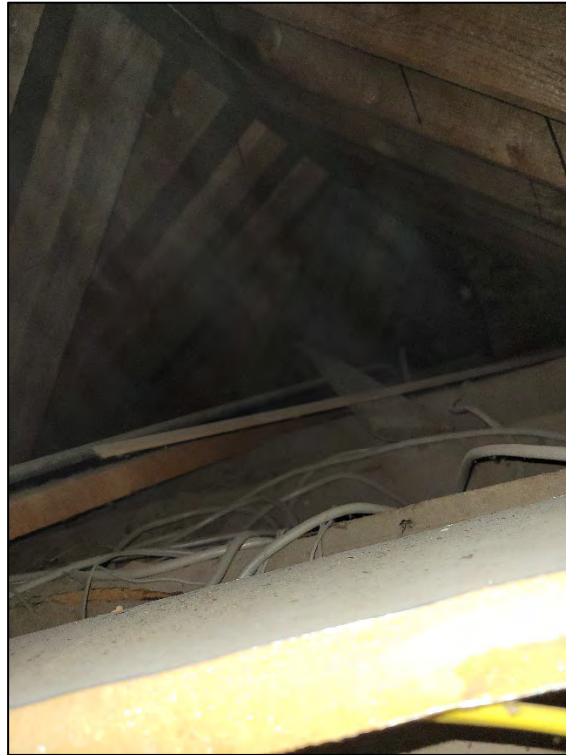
April 11, 2023. First Floor attic: wood framed attic with loose insulation, black tar from roof, and utilities running over trusses.
